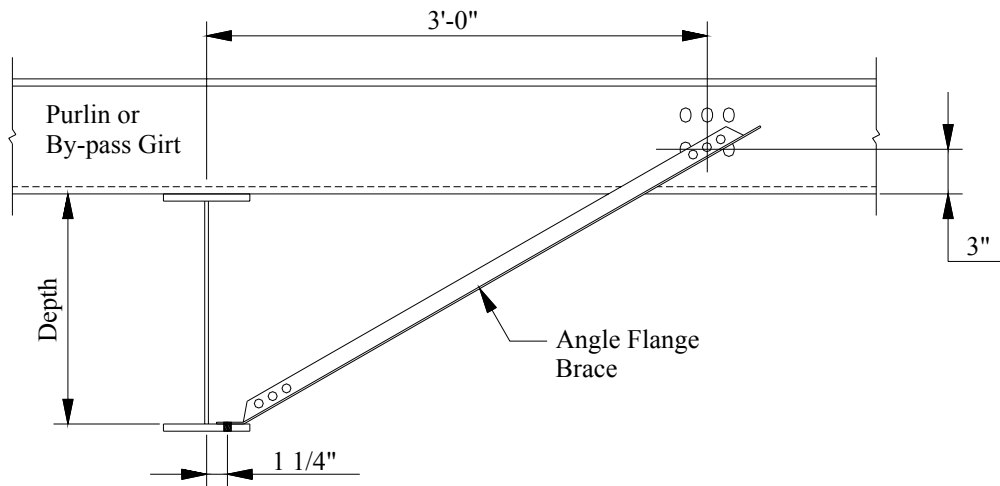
Typical Bracing Detail for Web-tapered Gable Frames
